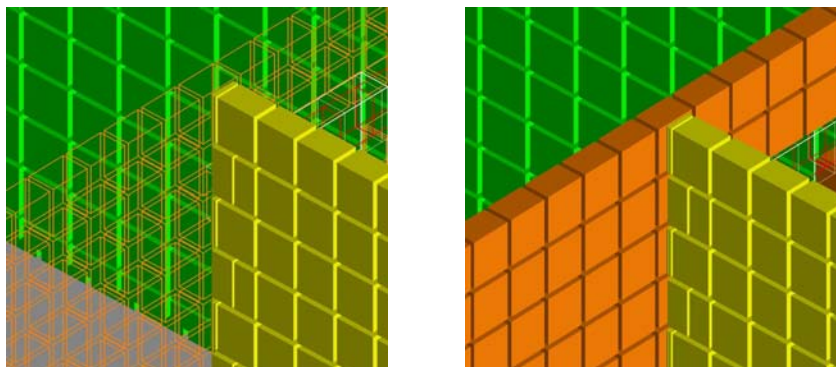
A 'fused' junction at the intersection of two internal walls.
